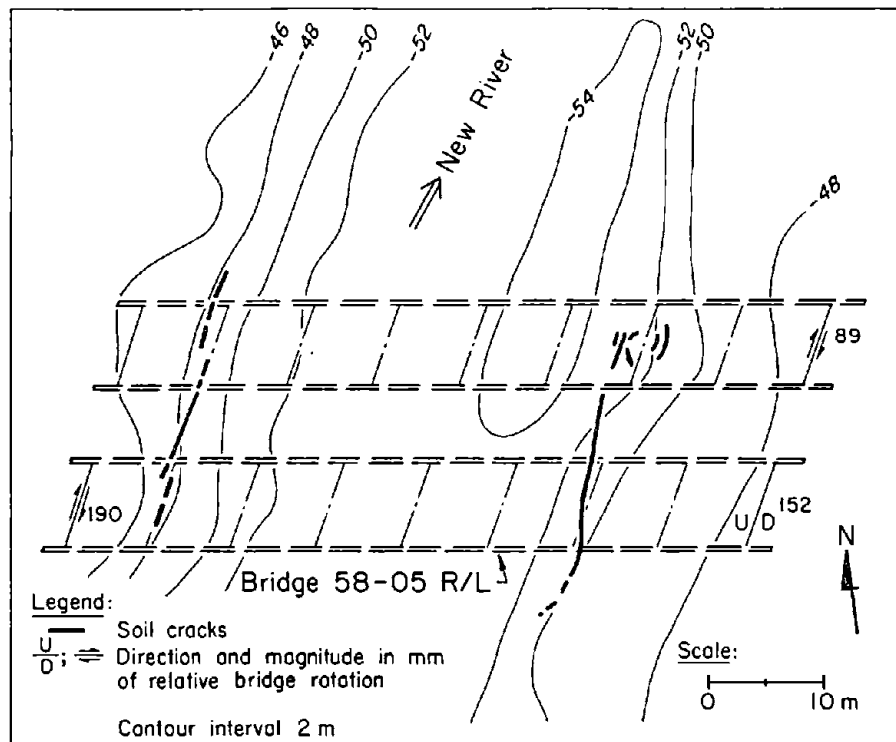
Plan View of Bridges 58-05 R/L Showing Ground Surface Topography and Location of Ground Cracks (after Youd and Wiczorek, 1982)
